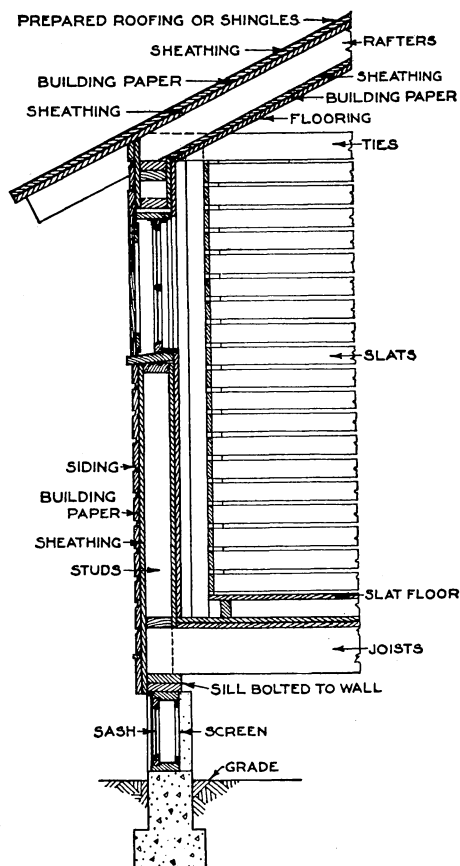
Details of the foundation, floor, wall, and roof construction of a sweetpotato storage house.
